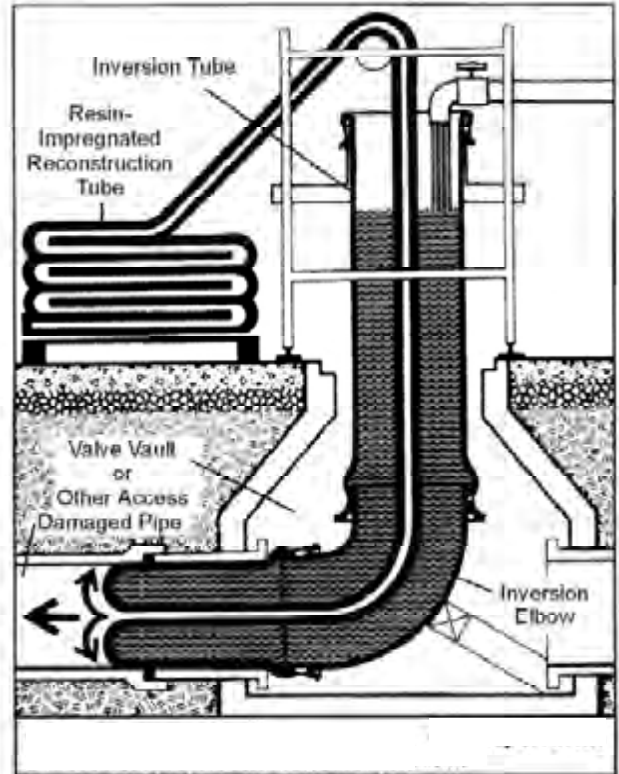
Filling the tube – feeding standpipe with cold water (Courtesy of AWWA)
